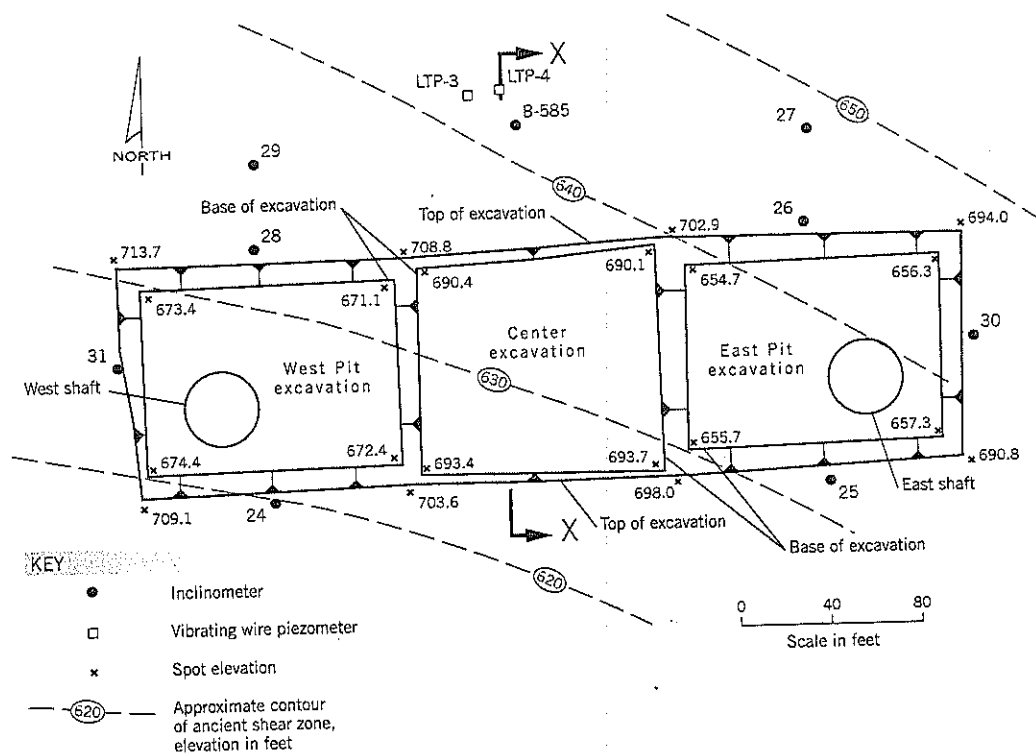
Washington Park Station. Plan of station excavations and field instrumentation.
